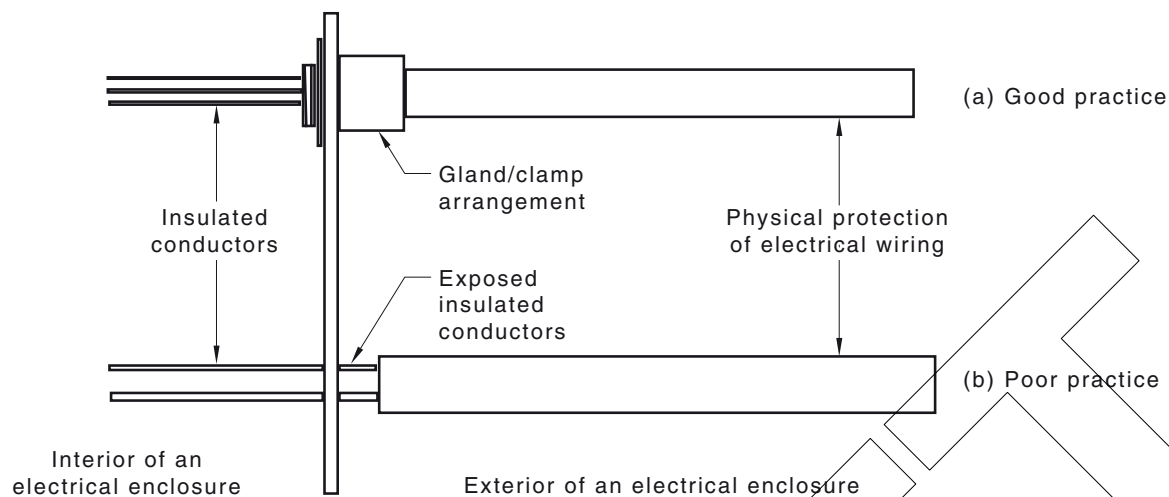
EXAMPLES OF GOOD AND POOR WIRING THROUGH WALLS
